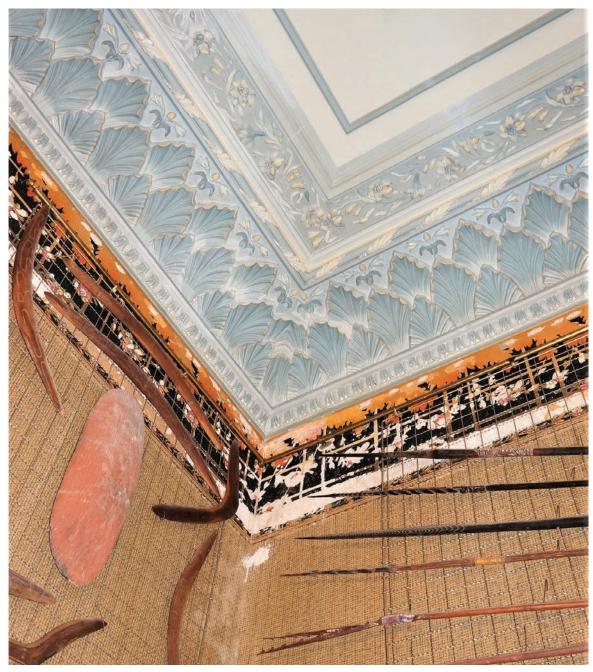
View of south east corner showing Edwardian Art Nouveau style frieze beneath the decorative plaster cornice. Beneath the frieze are brass grid frames fixed over wall paper that has a woven mat appearance. Note the cracks in the corner plaster within the depth of the frieze, and the deterioration of the painted frieze itself, possibly due to the presence of moisture. There is a rainwater pipe embedded in the external wall in this corner.
